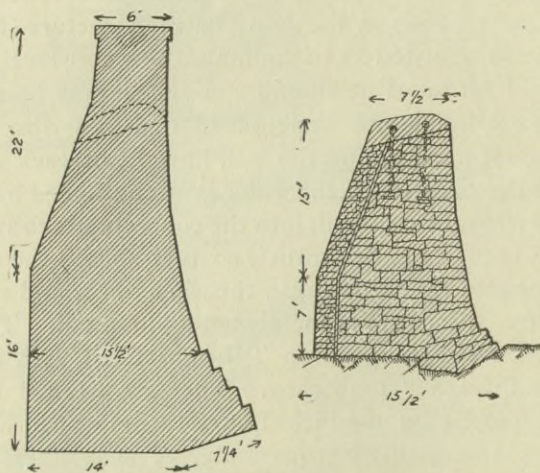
CROSS-SECTIONS OF NEWARK DAM AND WEIR.
